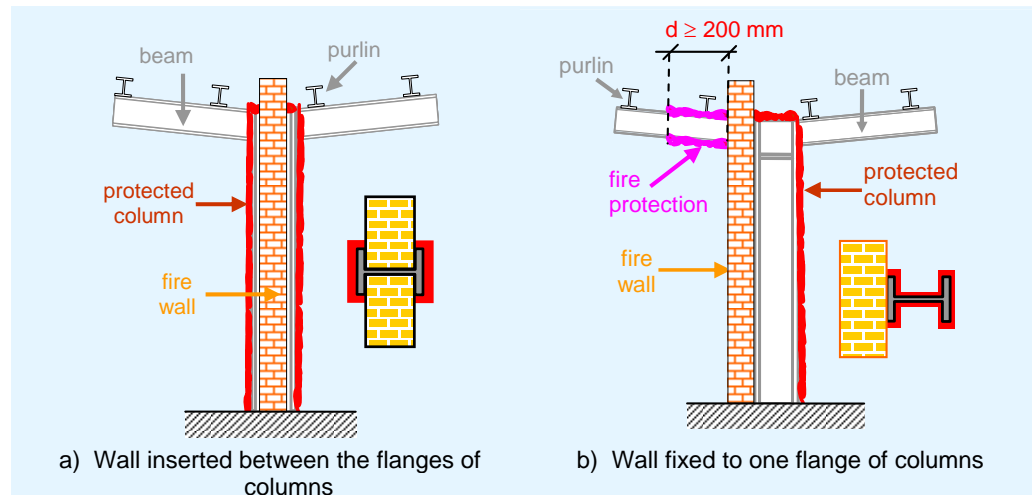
Design detail near fire walls perpendicular to portal steel frame
